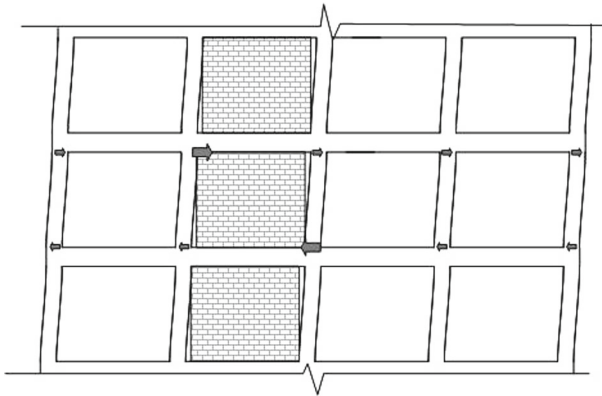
Shear force concentrations at beam–column junctions due to the presence of masonry infill
